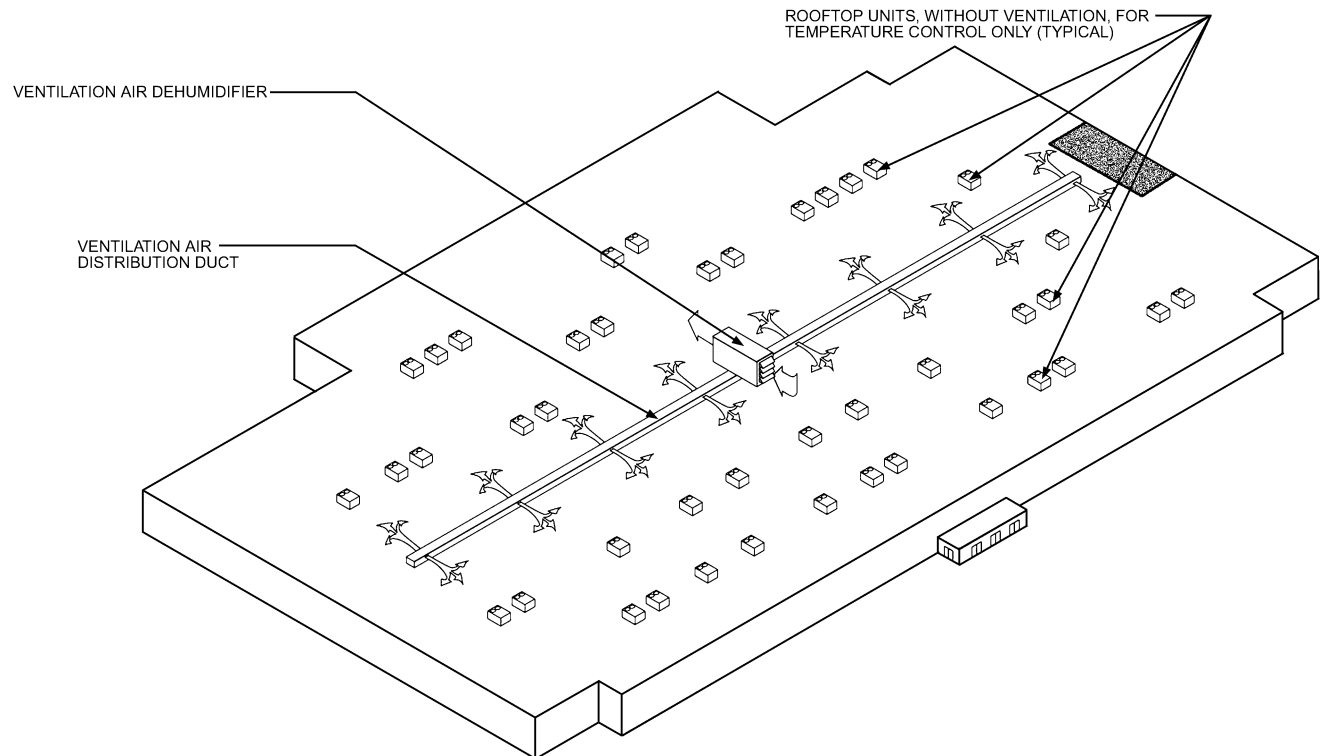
Typical Rooftop Arrangement for Drying Ventilation Air Centrally, Removing Moisture Load from Cooling Units
